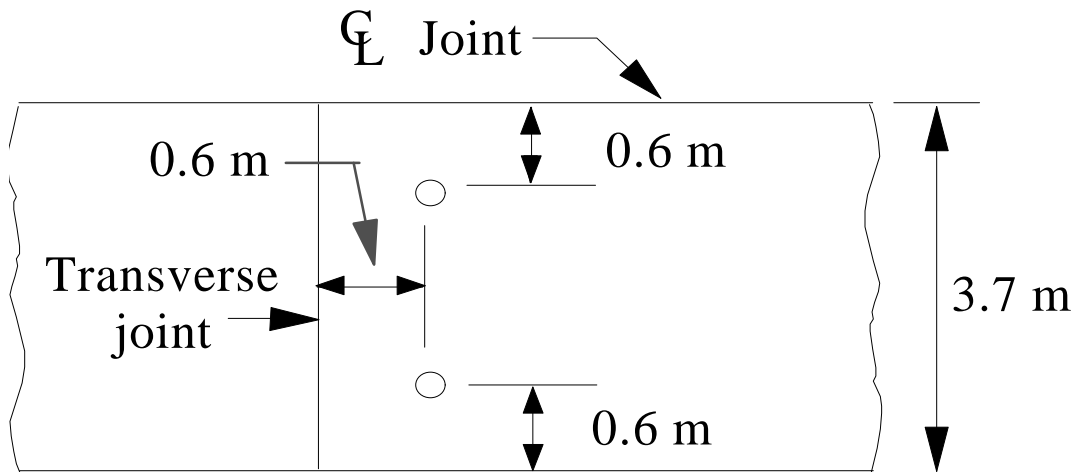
Typical hole pattern for jointed concrete pavements.
